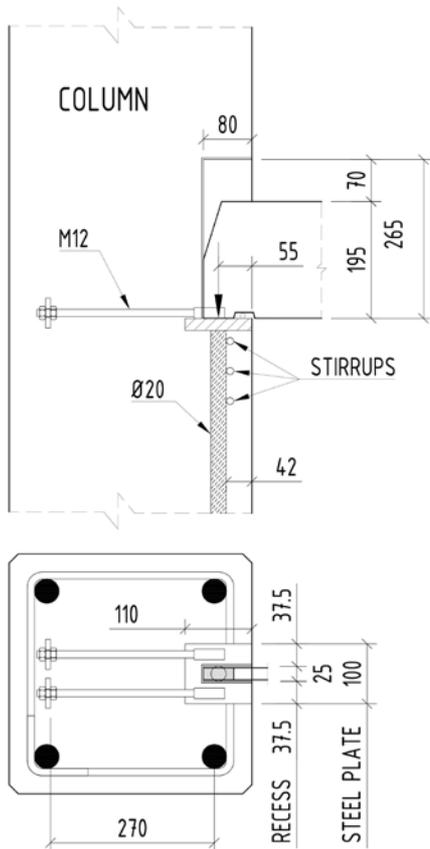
BSF225 column unit. (Centre stirrups are not illustrated.)
